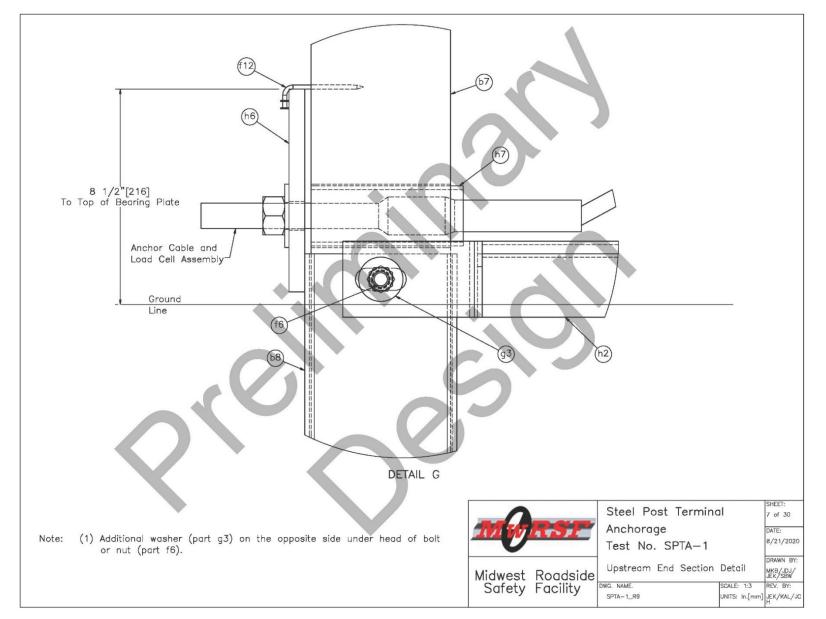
Upstream End Section Detail, Test No. SPTA-1
